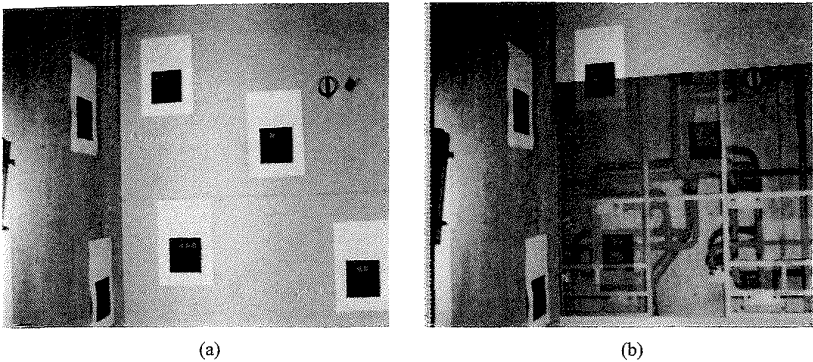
Seeing the piping in the wall. (a) Original image.
